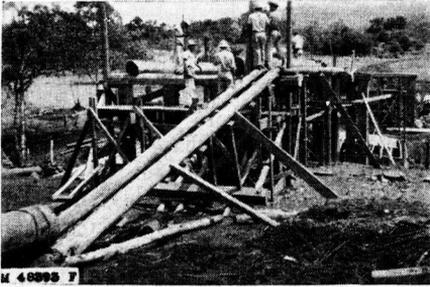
Bridge under construction at San Isidro, Costa Rica. All large timbers were hand hewn. Stringers were raised to floor level by block and tackle and skids. Lack of equipment, such as cranes, necessitates a large amount of heavy hand labor.
